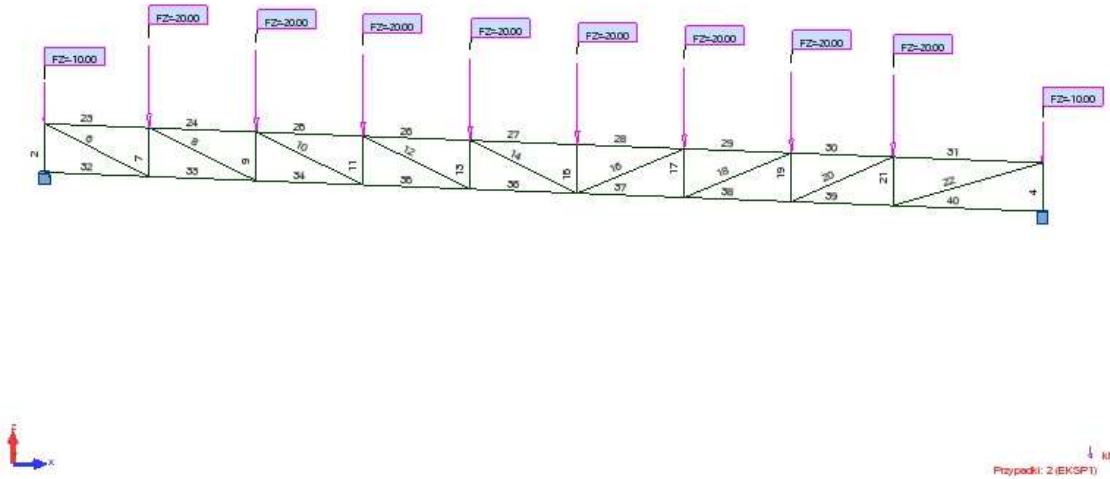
Truss with original shape and RHS cross-sections.
